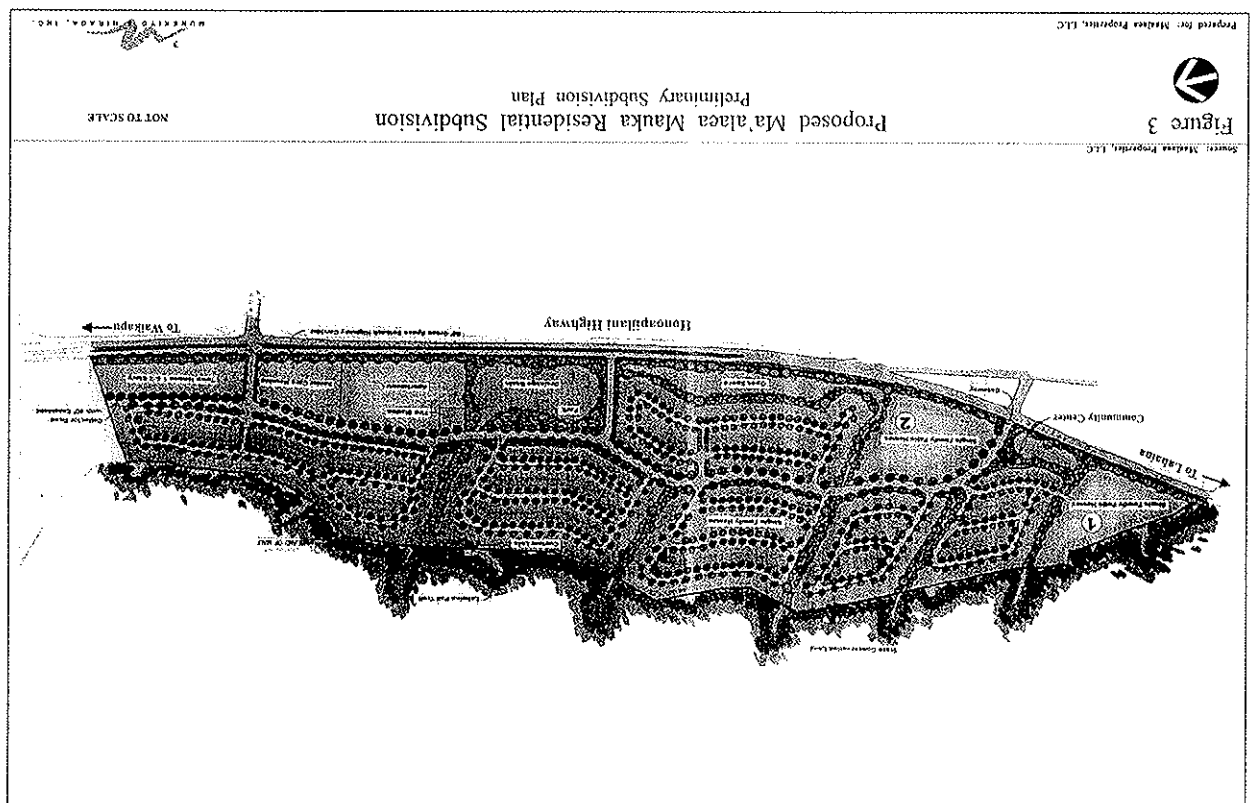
Proposed Ma'alaea Mauka Residential Subdivision Preliminary Subdivision Plan
